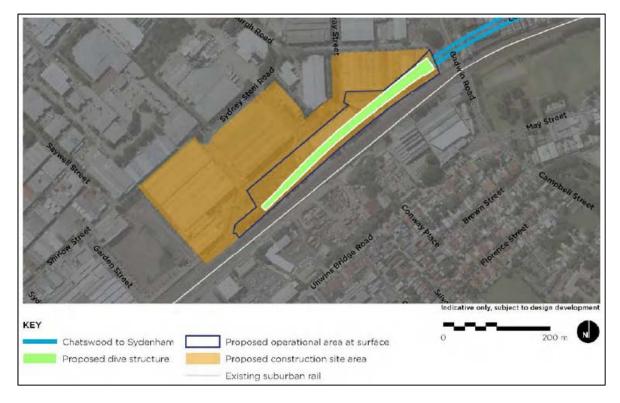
Marrickville dive site (Source: Chatswood to Sydenham Preferred Infrastructure Report)
